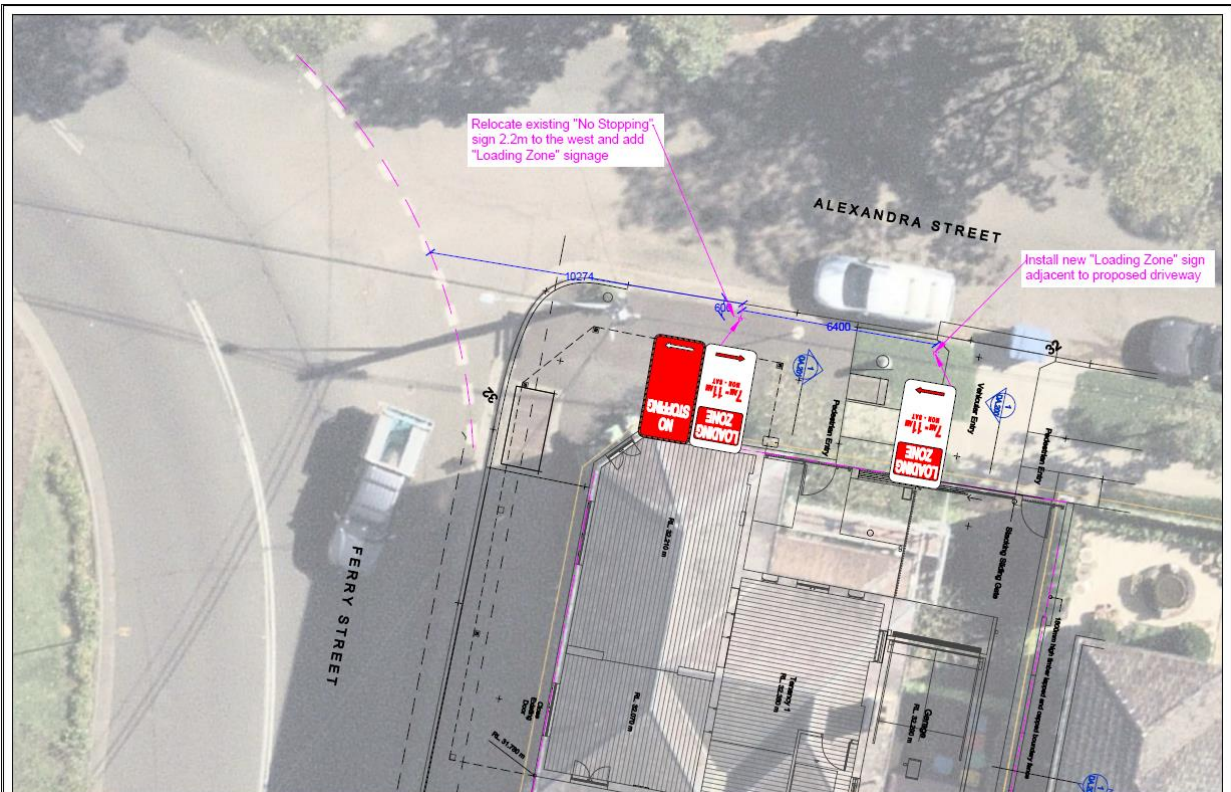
Signage Plan for 'Loading Zone' and adjustment of 'No Stopping' sign as per plan No. 2022-1055-02A issued by McLaren Traffic Engineering
